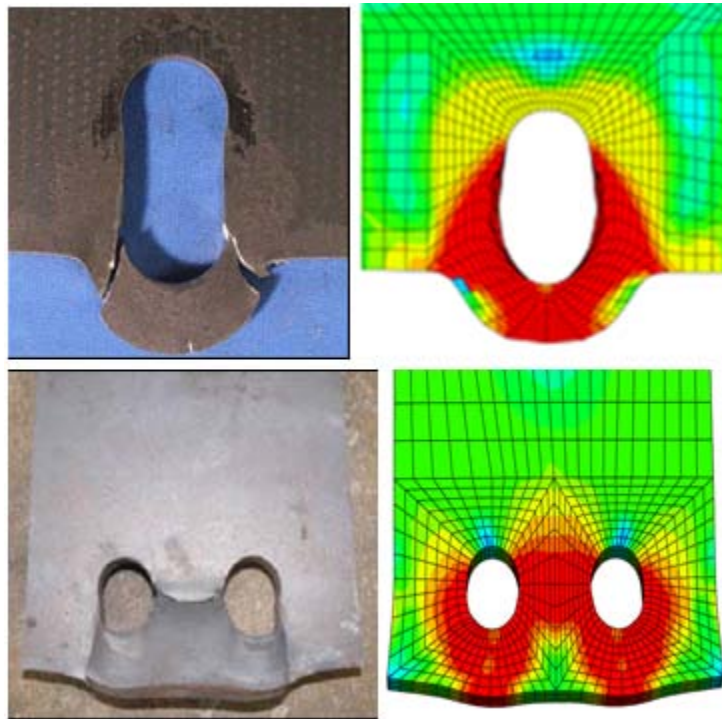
Deformations and stress contours of single bolt and twin-bolt connections
